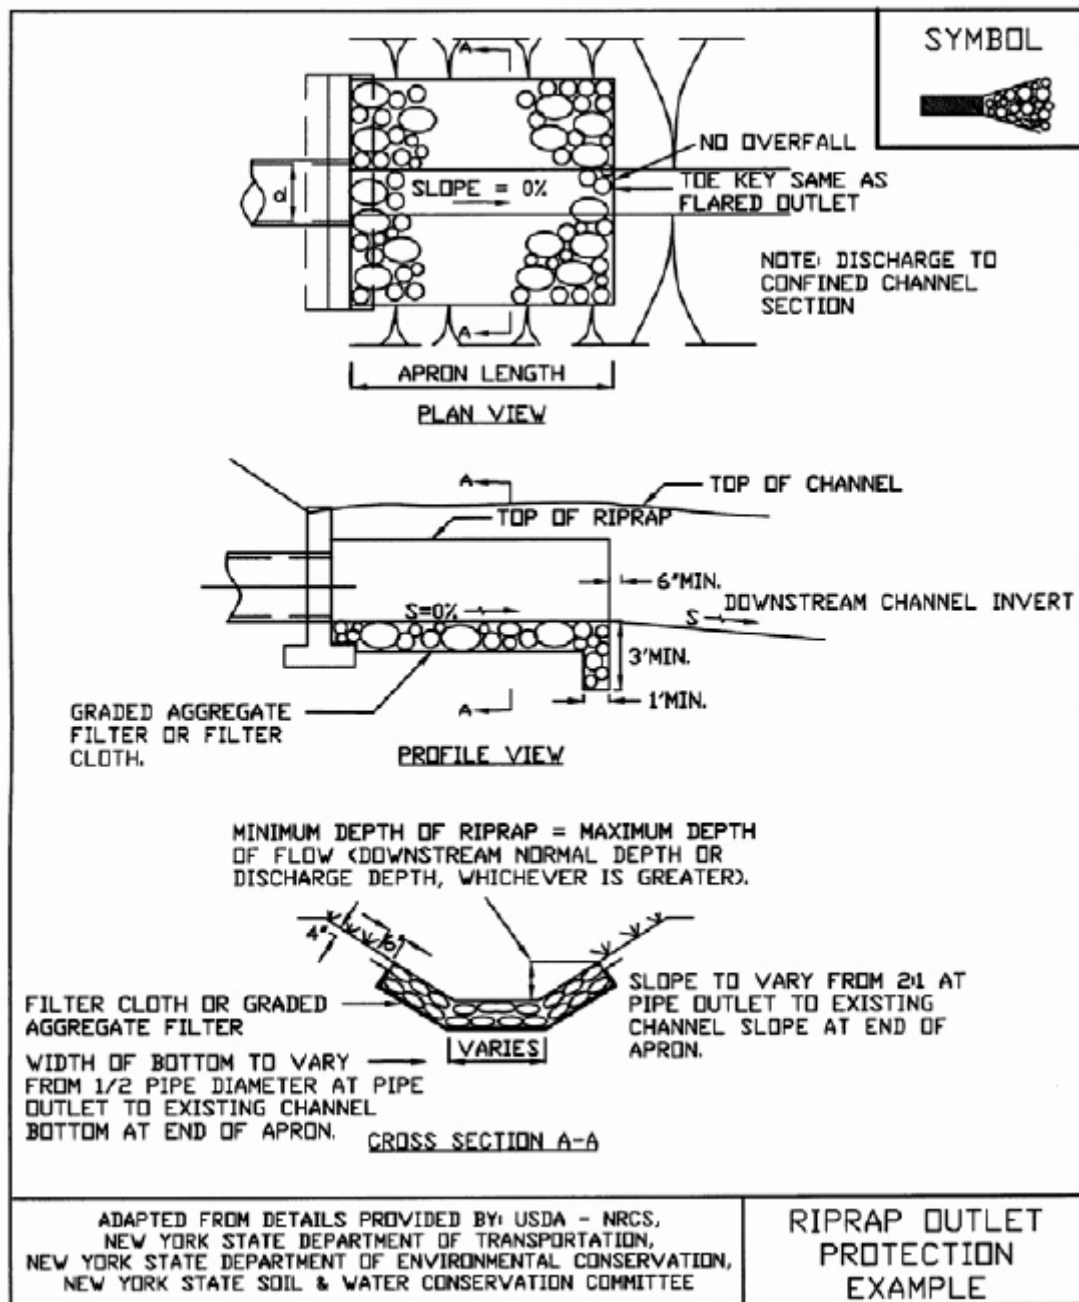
Riprap Outlet Protection: Discharge to Confined Section
